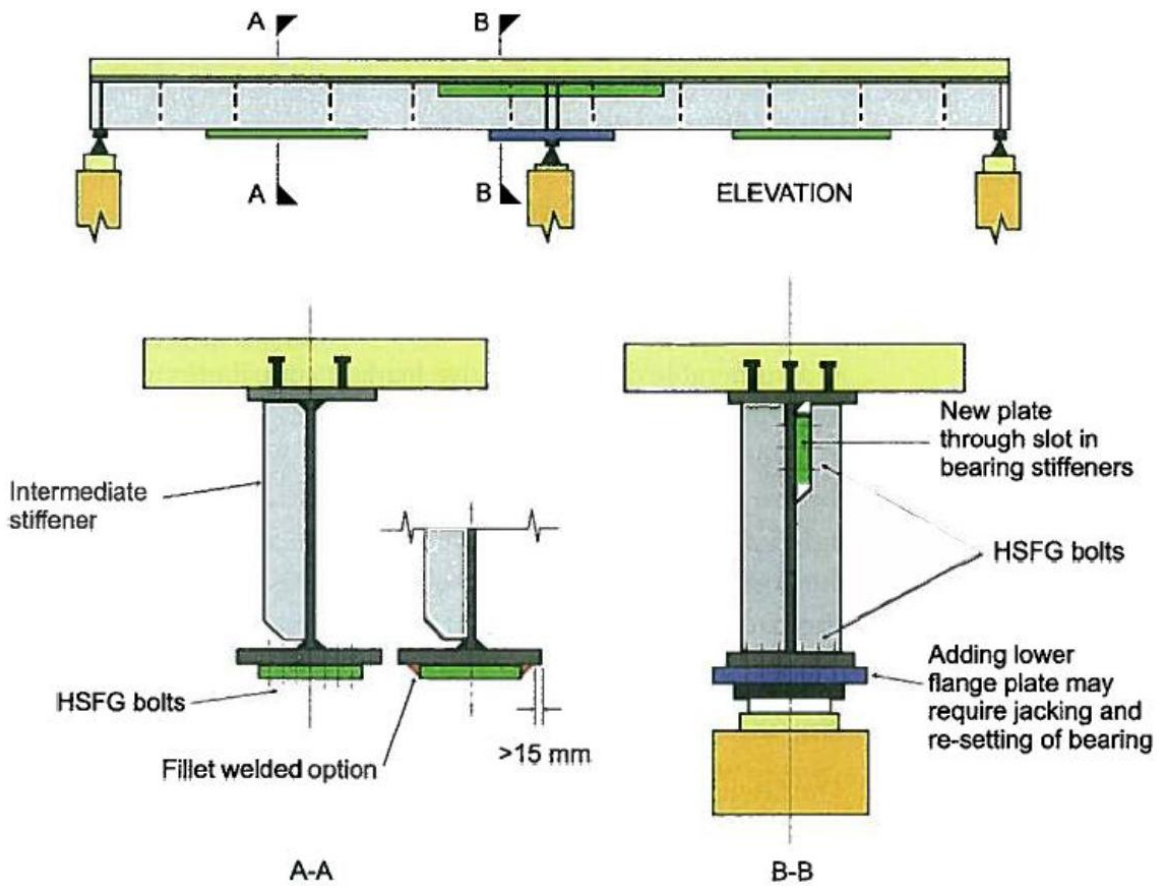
Typical strengthening of steel girder with steel plates (Tilly et al. 2008)
